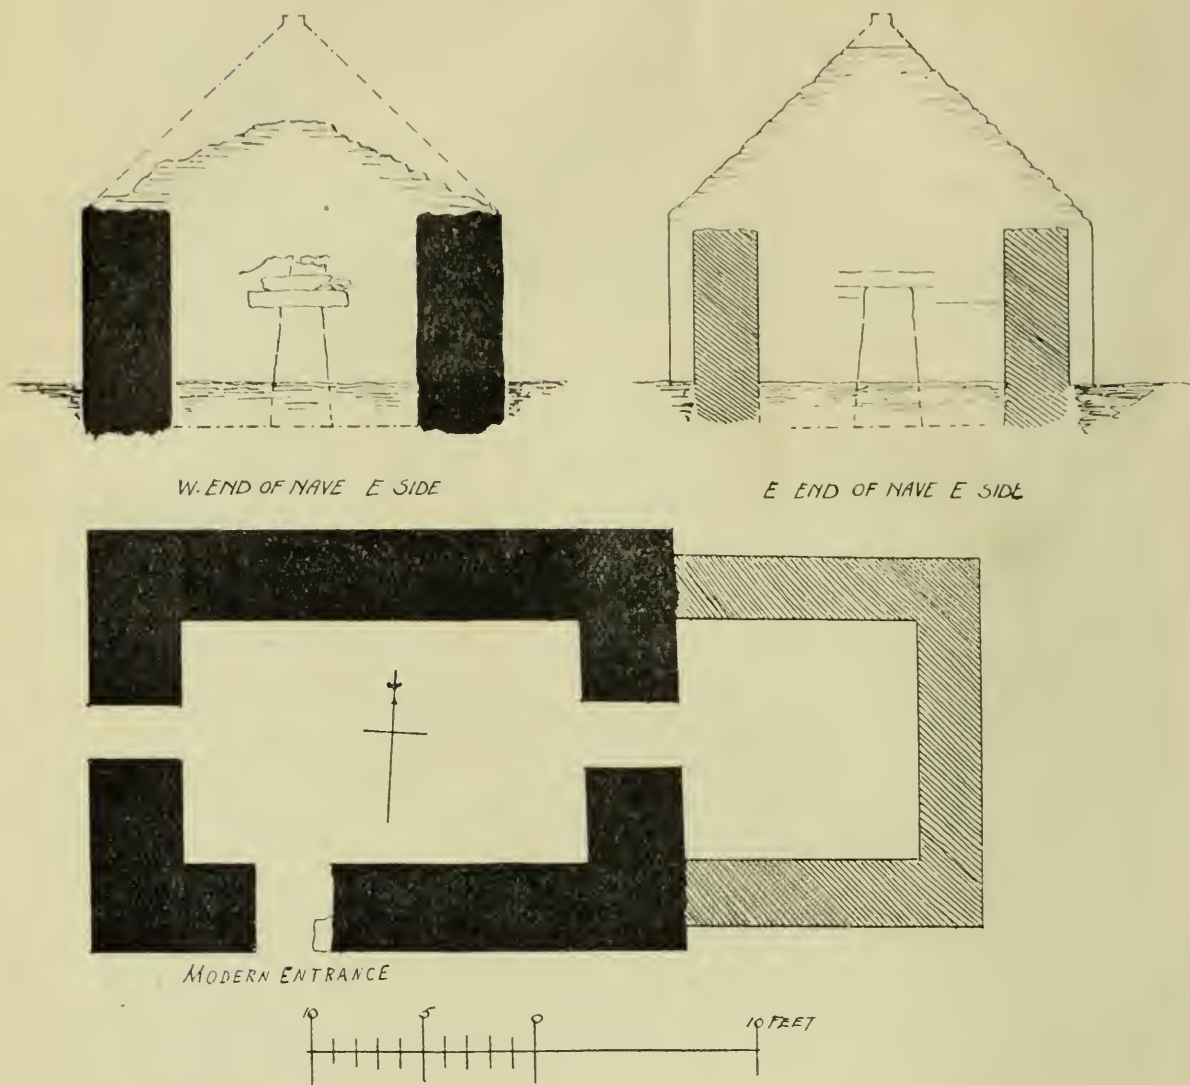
St Mary's Chapel, Lybster (No. 338); Plan and Sections.
